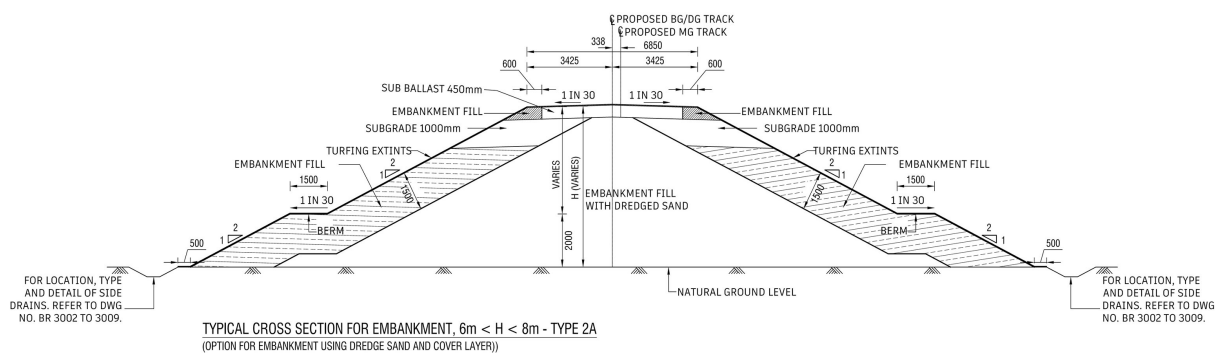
Typical cross section for embankment height 6 m to 8 m (Type 2A).
